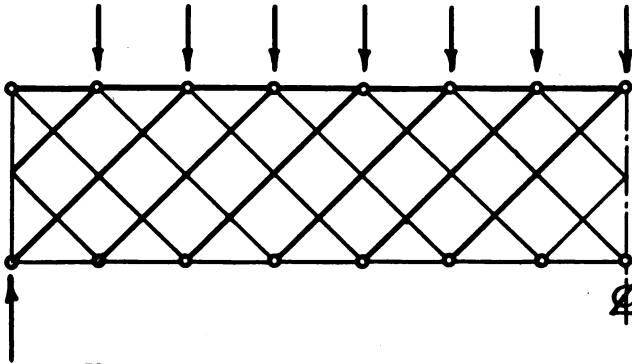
OUTLINE OF HALF-ELEVATION OF LATTICE-TRUSS.
